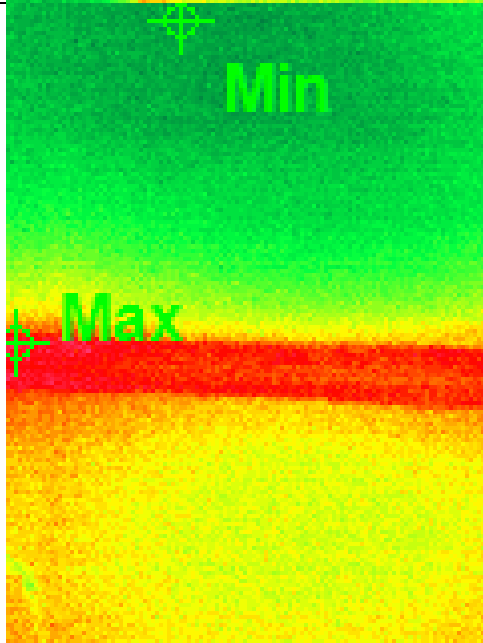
Infrared Image heat escaping through the foundation slab. Even though it is insulated from the hydronic section it still provides a thermal bridge to the exterior.
